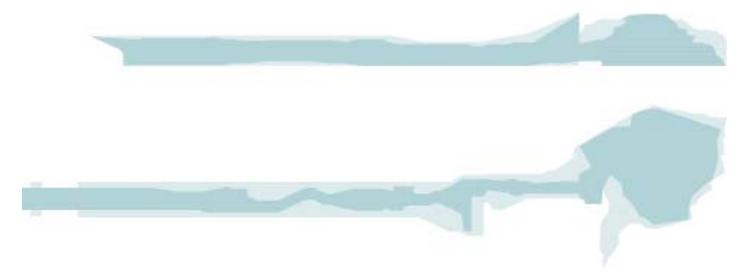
Final proposal for IFI Interiors Installation in linear form: elevation and plan
